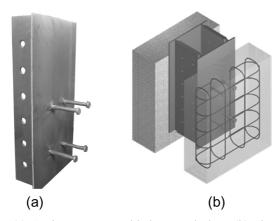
Push-out specimen: (a) Stud connector welded on steel plate, (b) Sketch of push-out specimens
